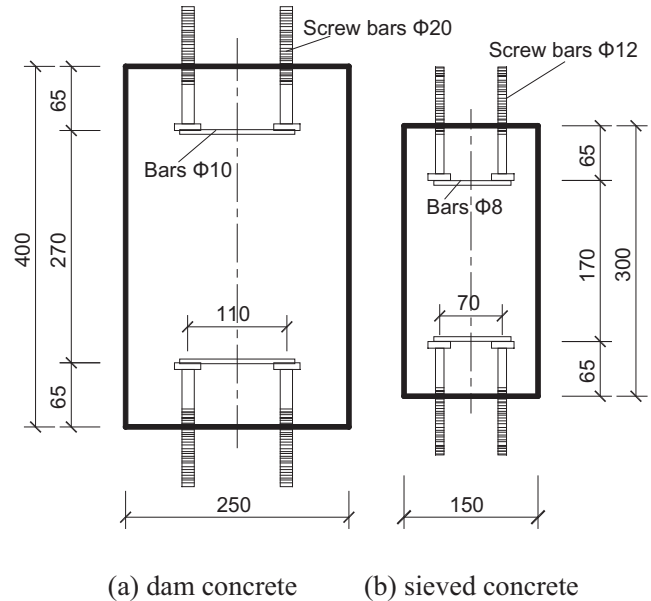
Specimens size of dam and sieved concrete (unit: mm).
